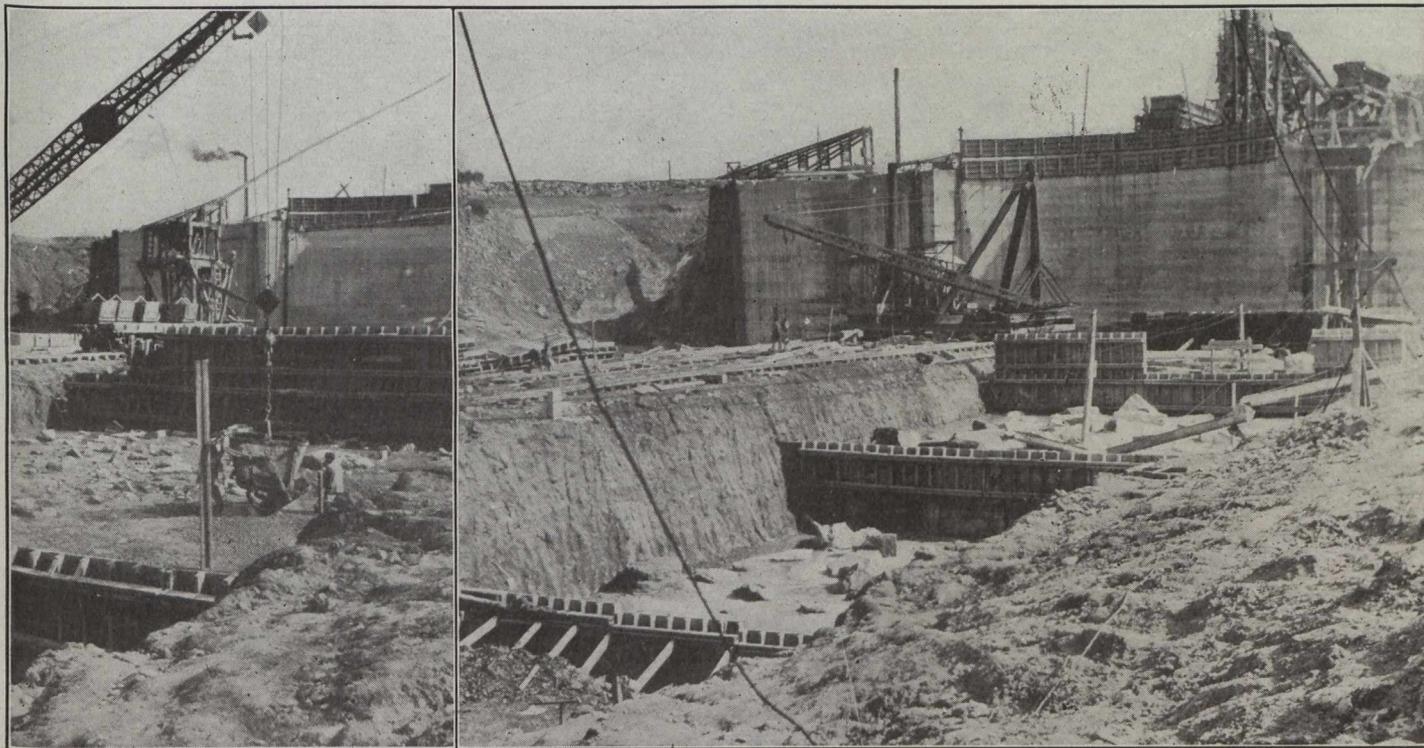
Views of Breast Wall of Lock No. 2, and Monoliths of West Lock Wall Under Construction.
